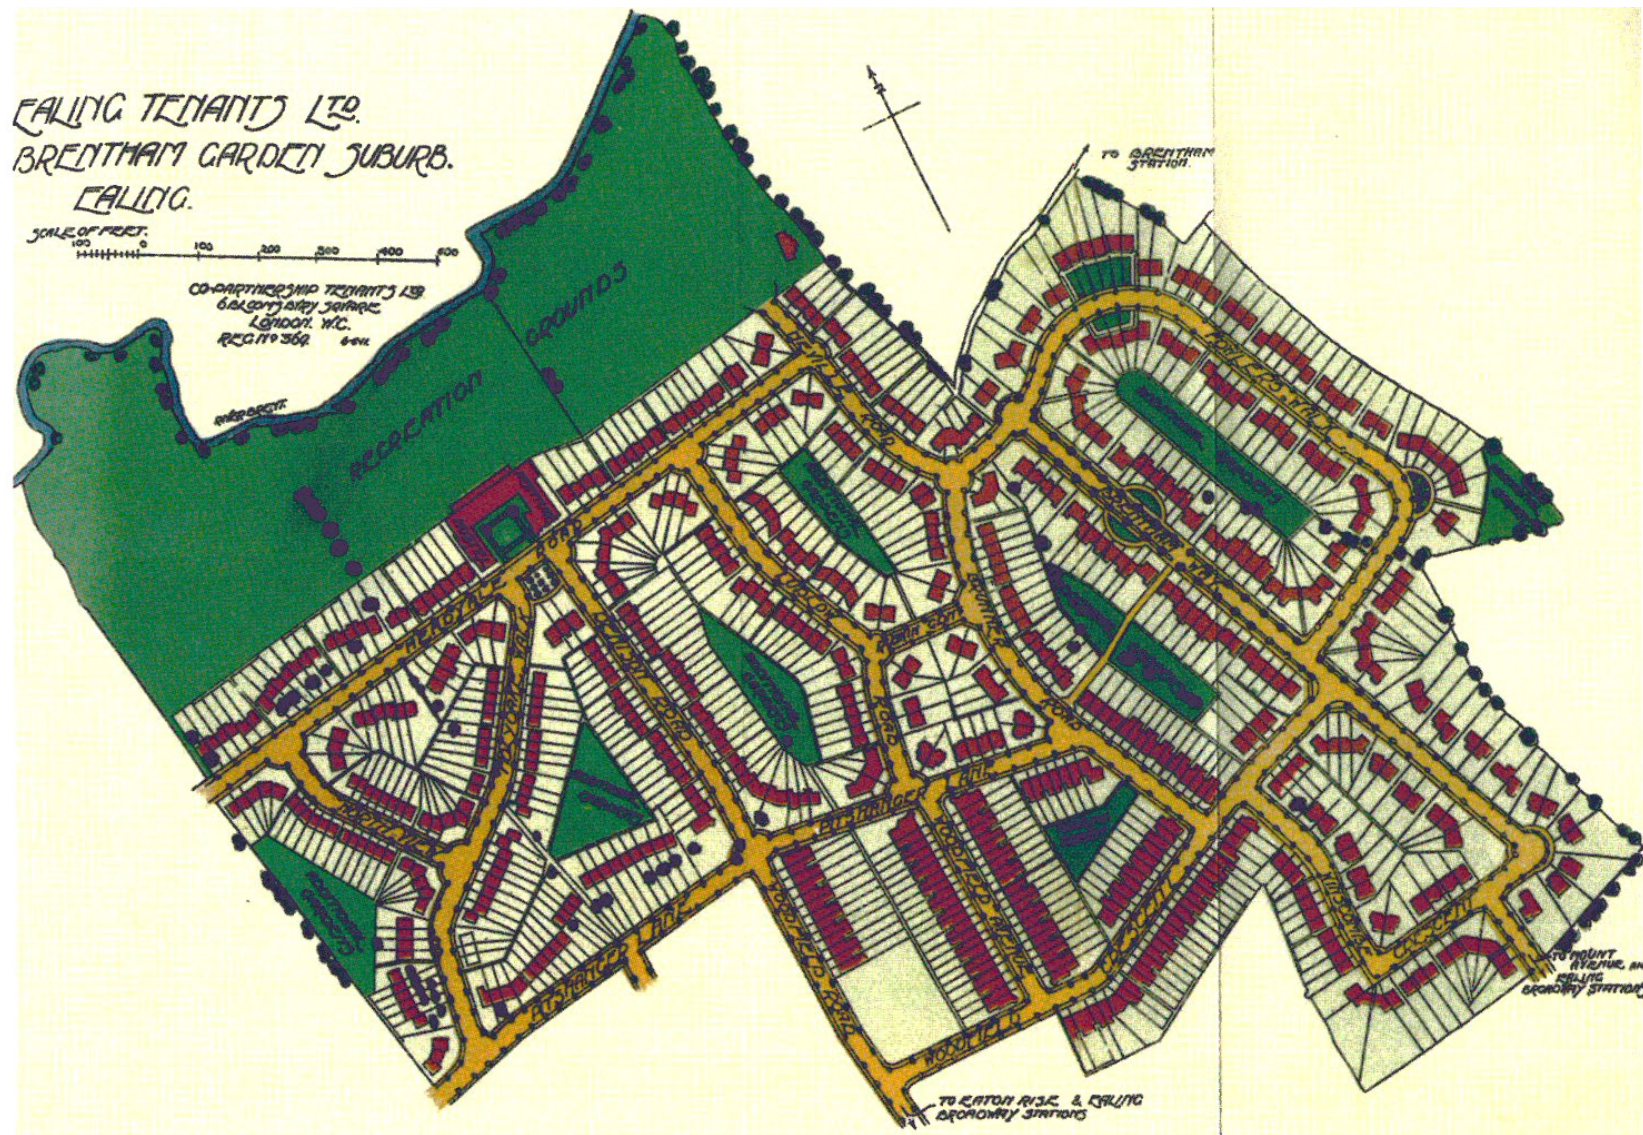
Plan of Brentham Garden Suburb in 1911.
